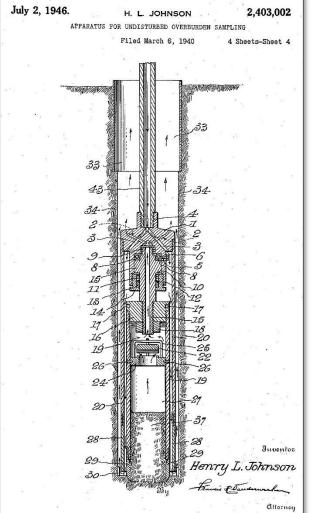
Enlarged view of the Denison Core Barrel within a drill hole.
